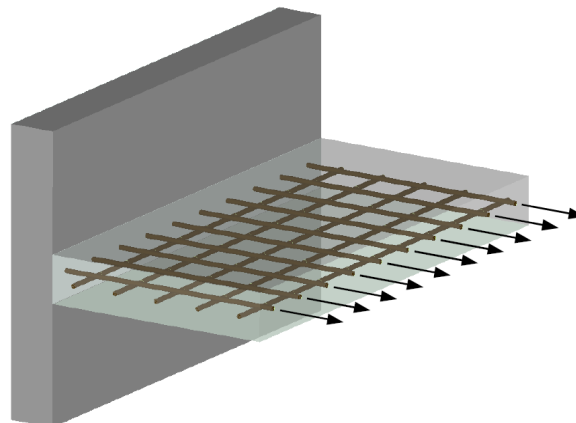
Extraction of a three-dimensions function of reinforcement out of a reinforced concrete plate.
